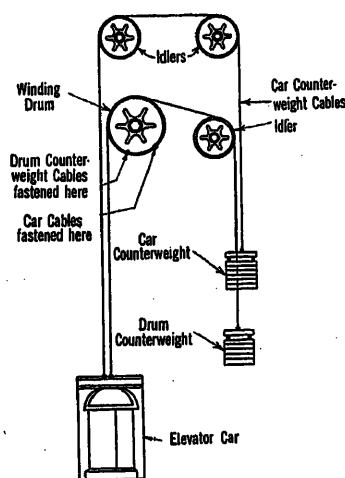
TYPICAL ROPING FOR OVERHEAD DRUM-TYPE ELEVATOR
